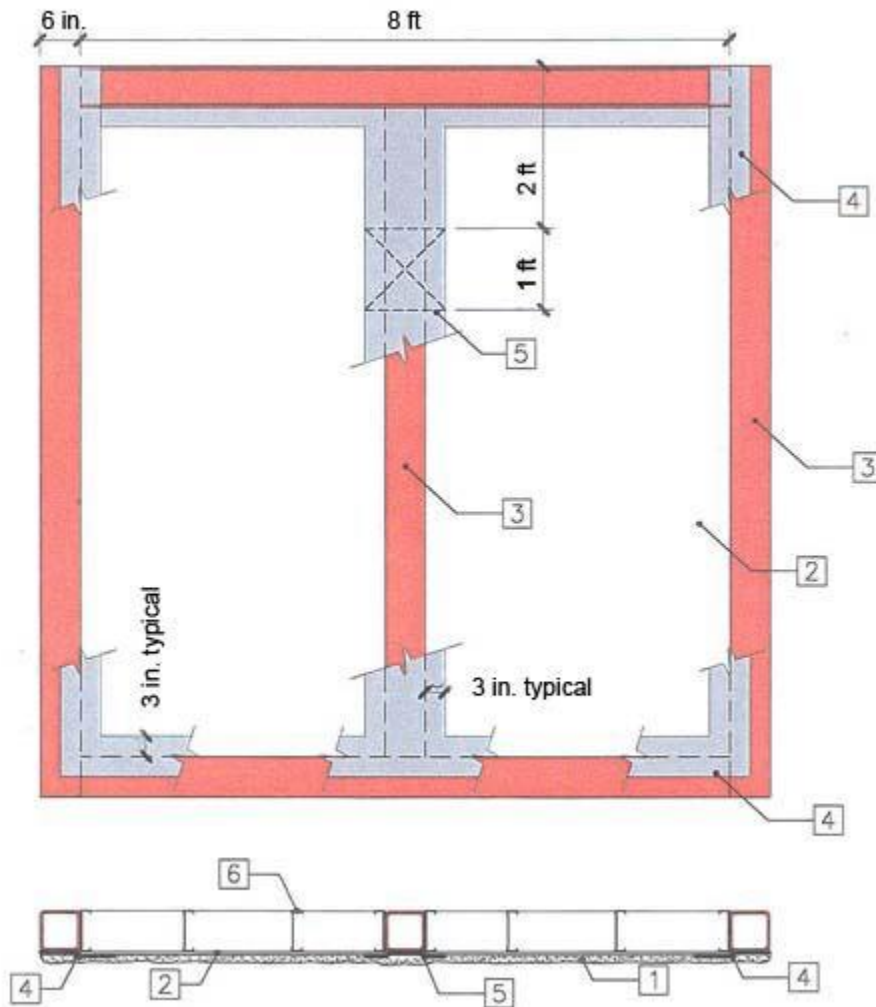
Specimen No. 3: Example of continuity across joints with transition membrane in gypsum and metal stud infill wall with a steel frame
